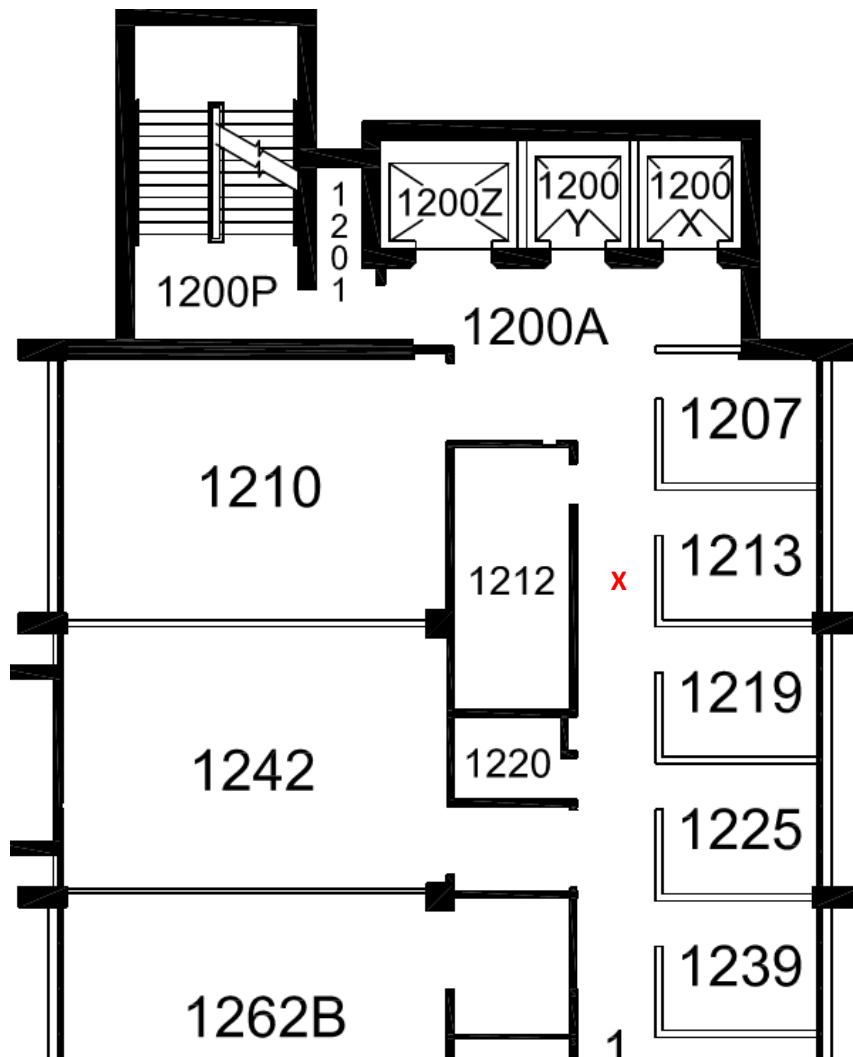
Extract from floor plan of 12th floor (similar to 10th and 11th floor plans)
